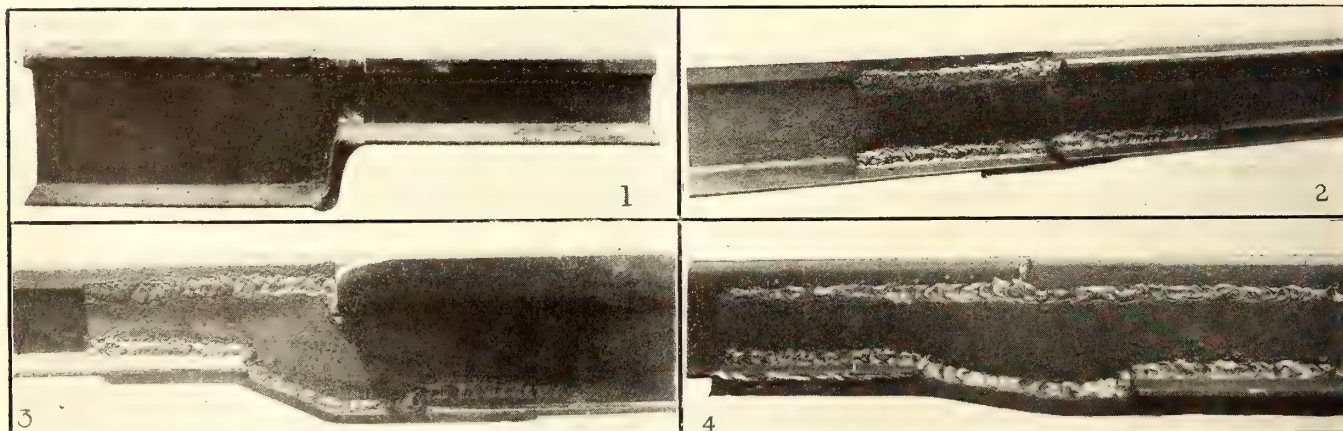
Compromise thermit joint between 9-in. trilby rail and 5-in. T-rail. Fig. 2—Electric arc welded compromise joint between two rails of approximately the same size. Fig. 3—Electric arc welded compromise joint between 5-in. T-rail and 7-in. girder guard rail. Fig. 4—Electric arc welded compromise joint between 4  $\frac{1}{4}$ -in. T-rail and 5-in. T-rail.
